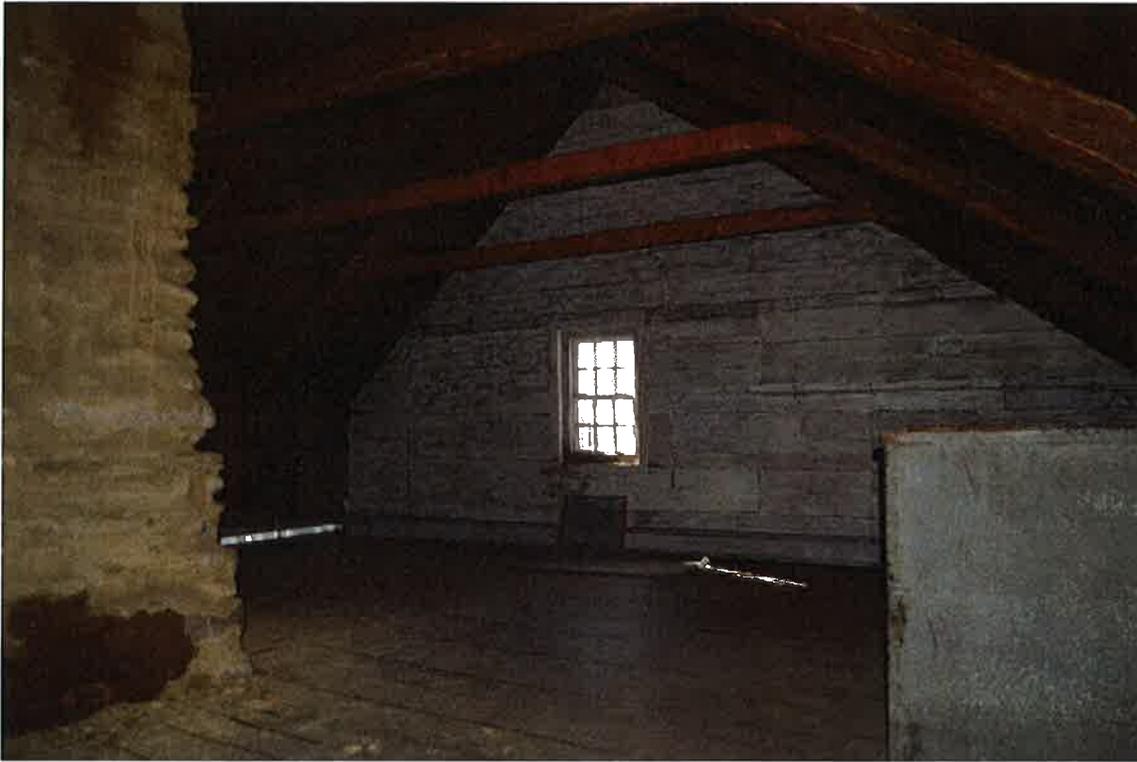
Attic looking southwest towards the west attic wall. Ghost marks of a nineteenth-century window are visible north of window, and the two collar beams to the west of the chimney are replacements.
